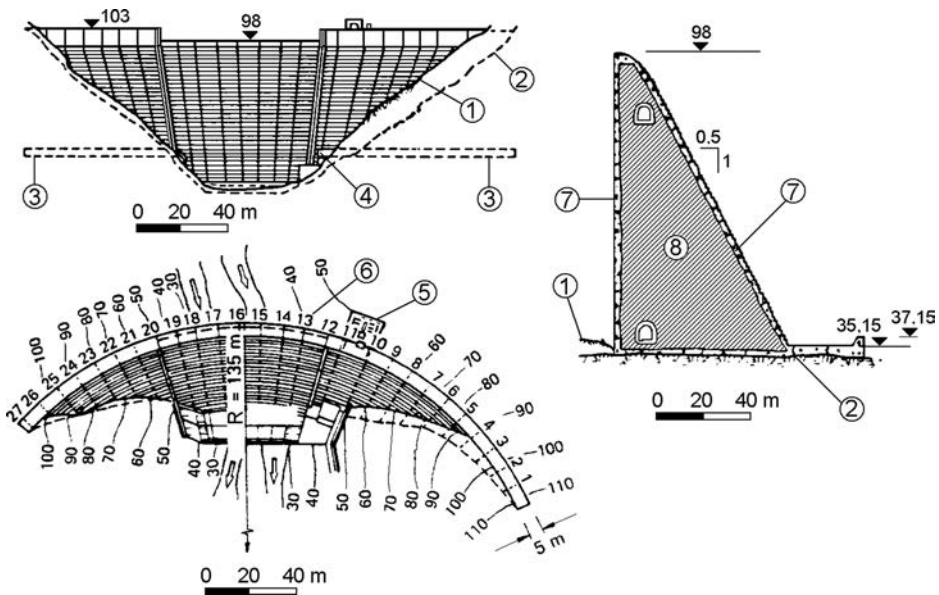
Layout plan and sections for Wolwedans dam. (1) Ground line; (2) bedrock line; (3) drainage tunnel; (4) gate structure of the discharge outlet; (5) inlet tower for the outlet; (6) number of induced cracks; (7) surface layer of concrete.
